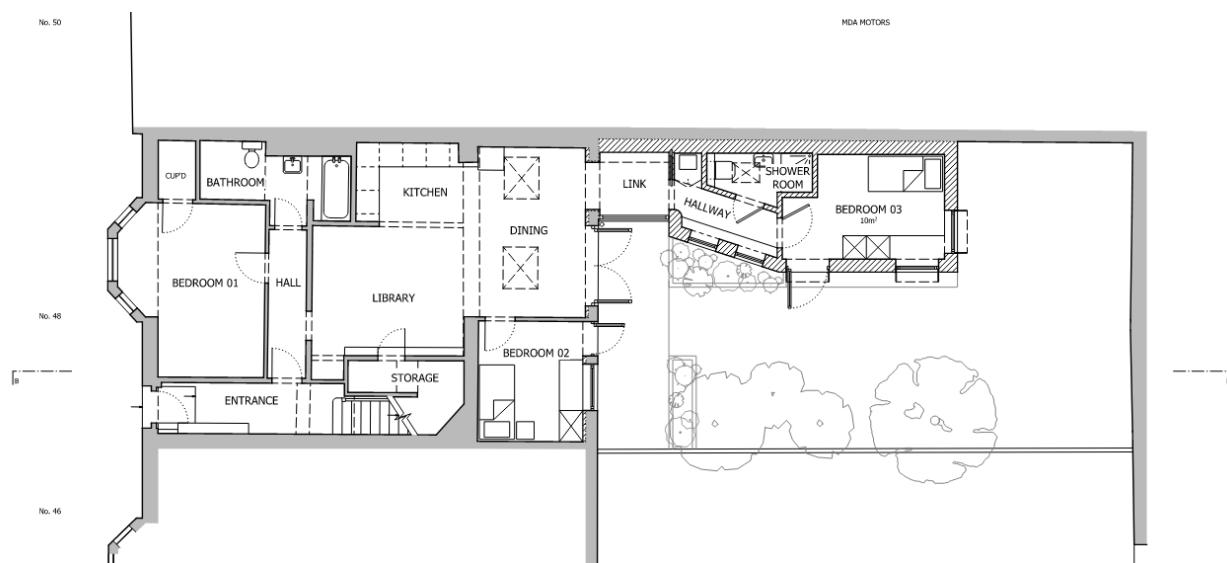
Proposed Ground Floor Plan showing rear extension (source: Application documents)
